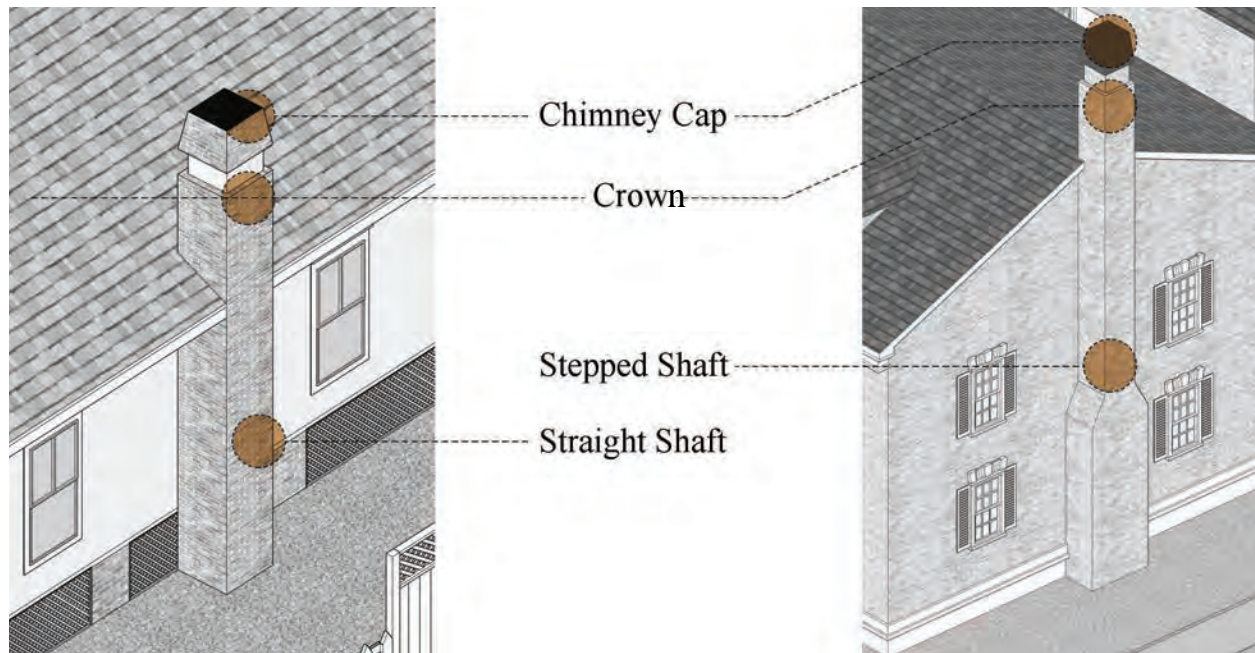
Fully Exposed Straight-Shaft and Stepped Masonry Chimneys
